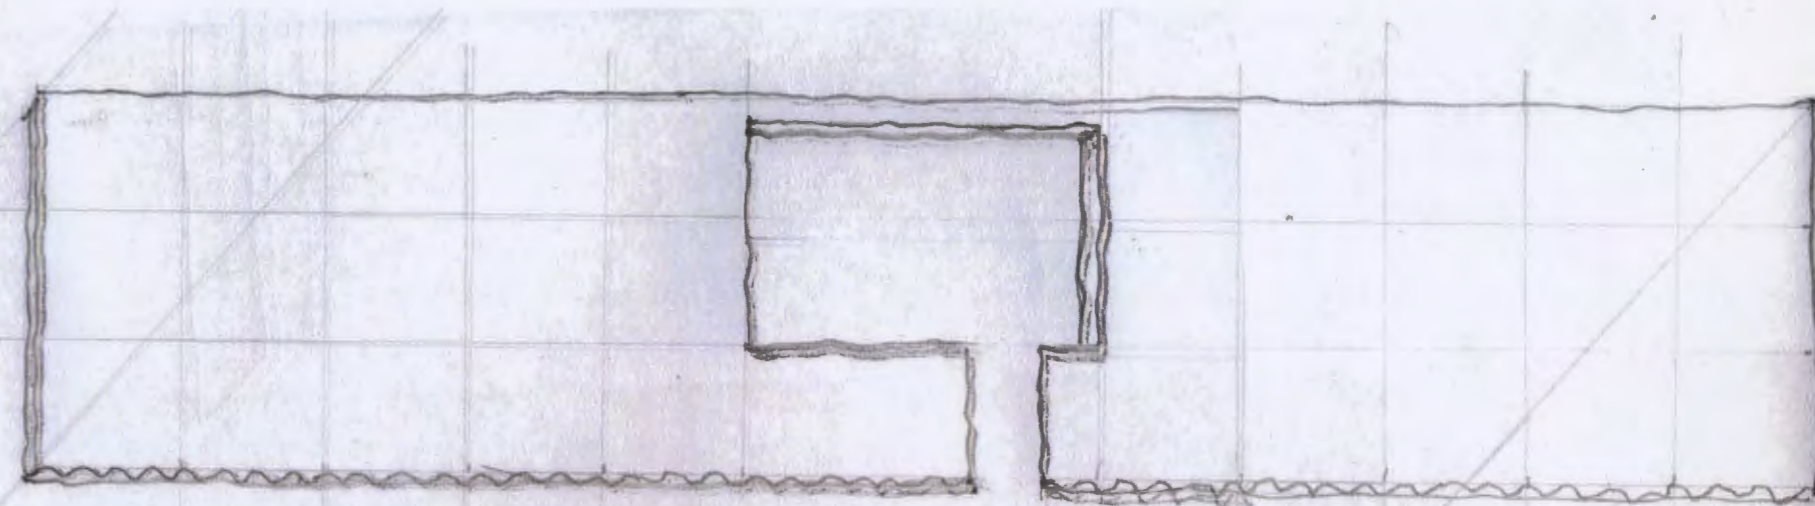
typical cross-section through tower block. Section shows the perimeter upstand beam and the large transfer beams in between.
